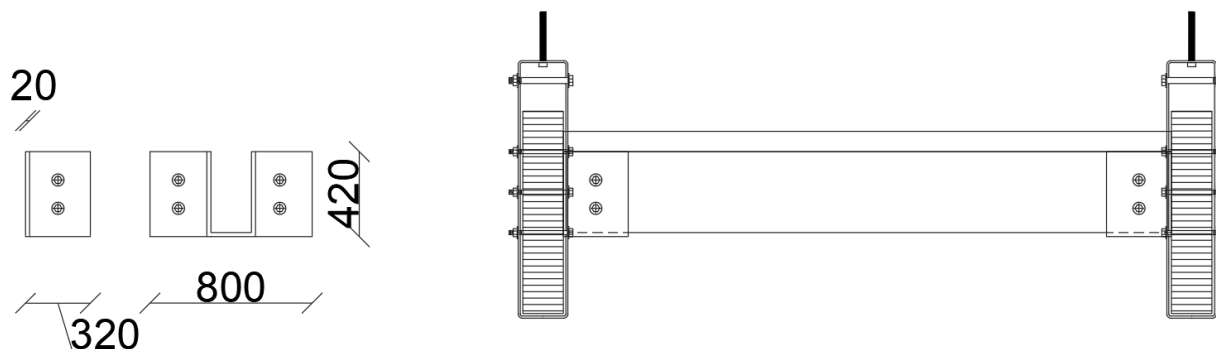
Connection Design Proposal – Secondary to Primary Beams
